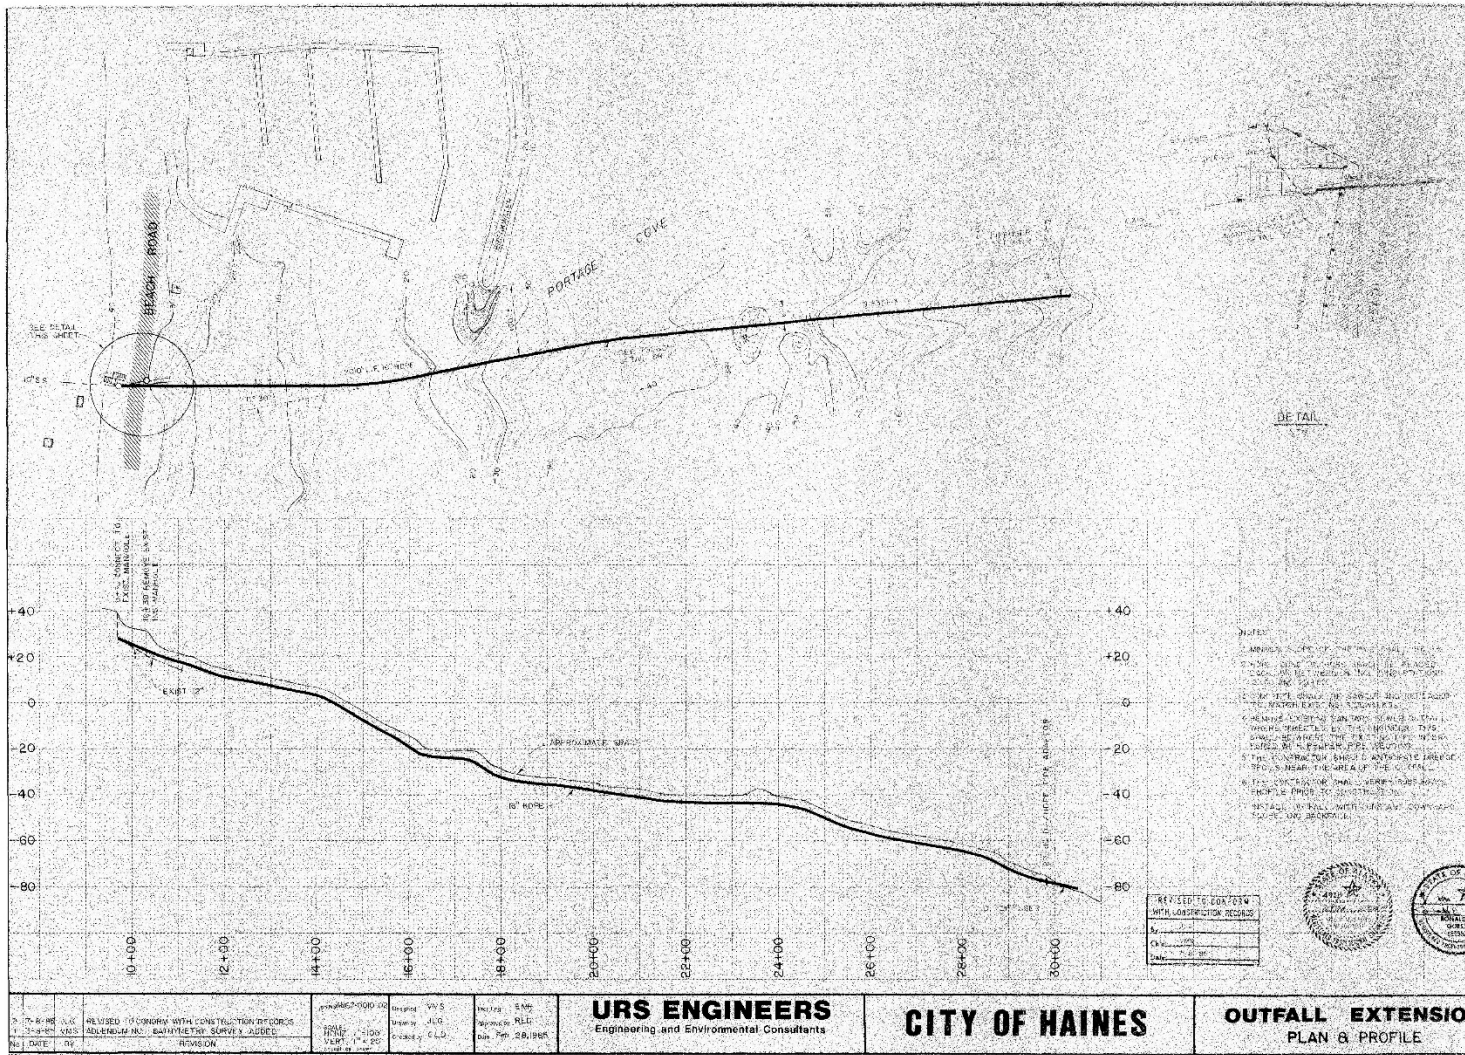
Haines Borough Sewer Outfall Plan View and Cross Section
